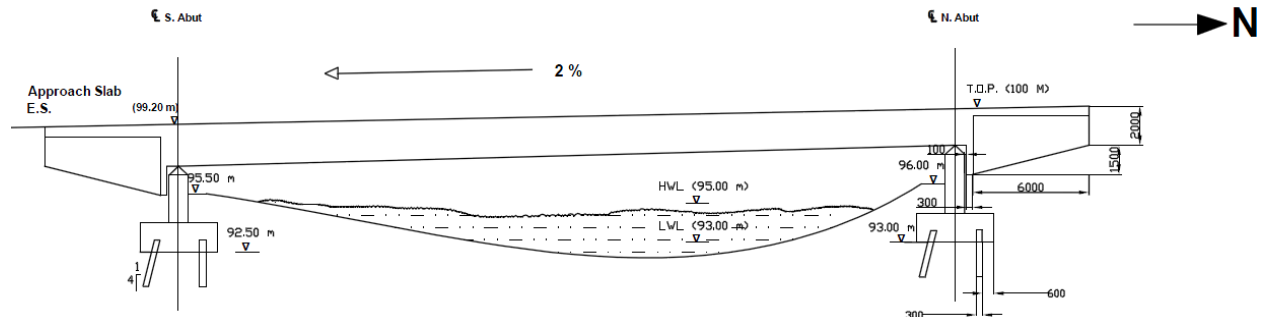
Elevation of the existing bridge (dimensions are in mm)
